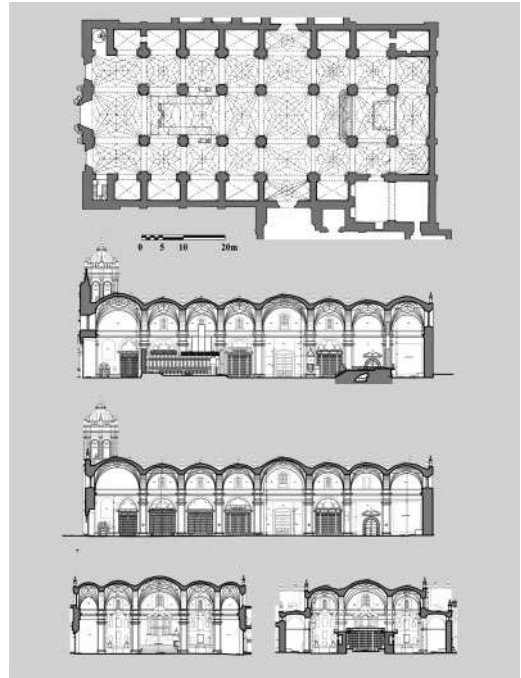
Cathedral of Cusco. Architectural survey: floor plan, longitudinal and transverse sections.
